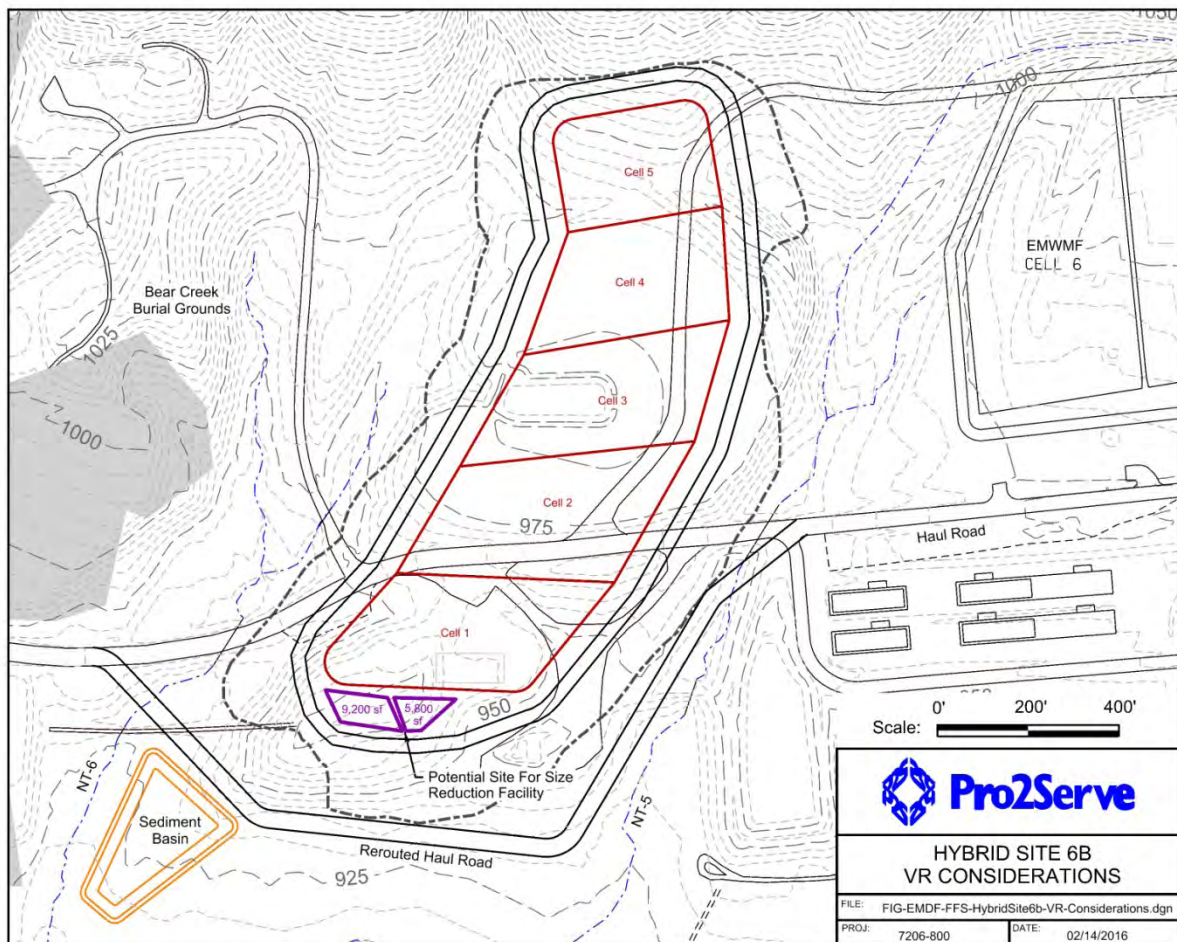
EMDF Layout for Site 6b of the Hybrid Disposal Alternative, Showing VR Facility Location
